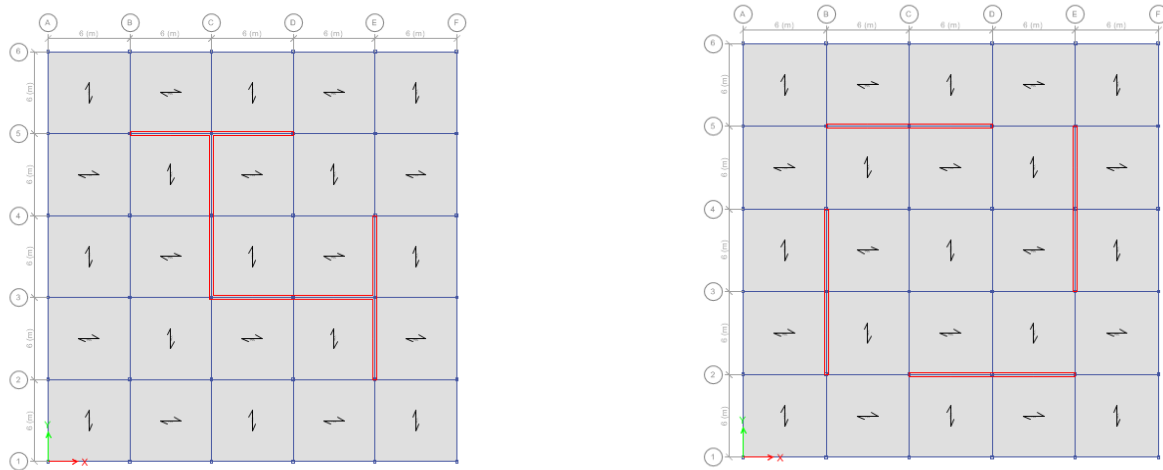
Placement of rectangular and T-shaped shear walls in the plan of a 30-story building.
